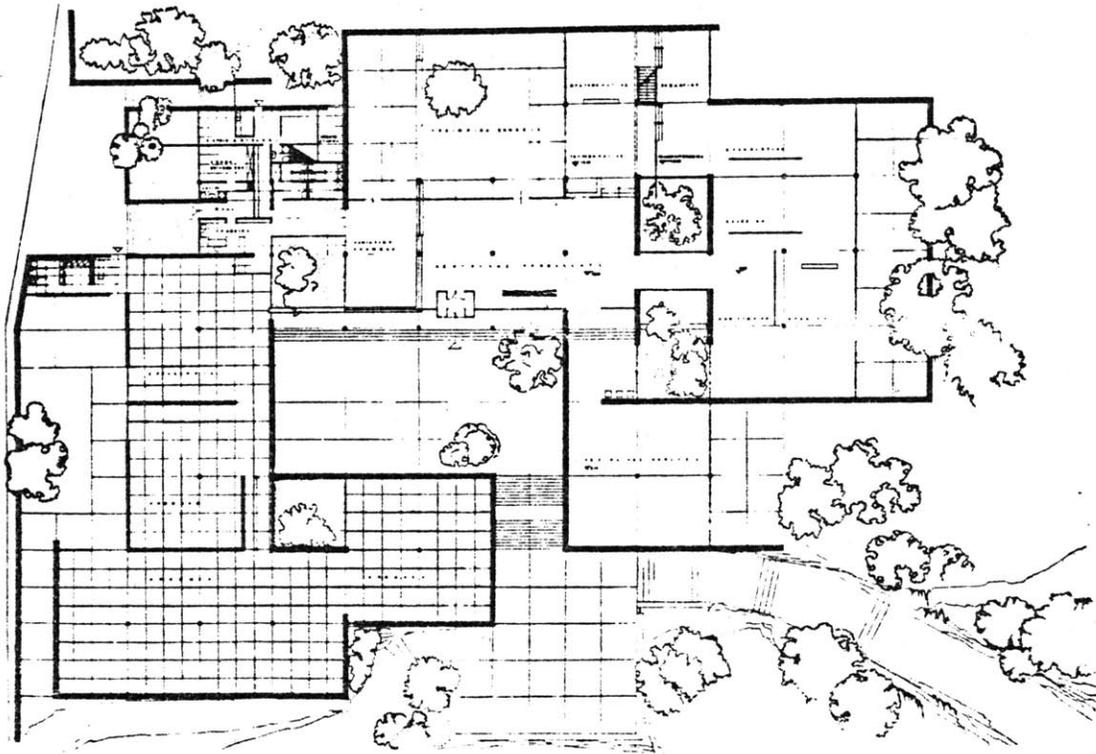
The Chios Museum winning entry 1965. Ground floor plan.
